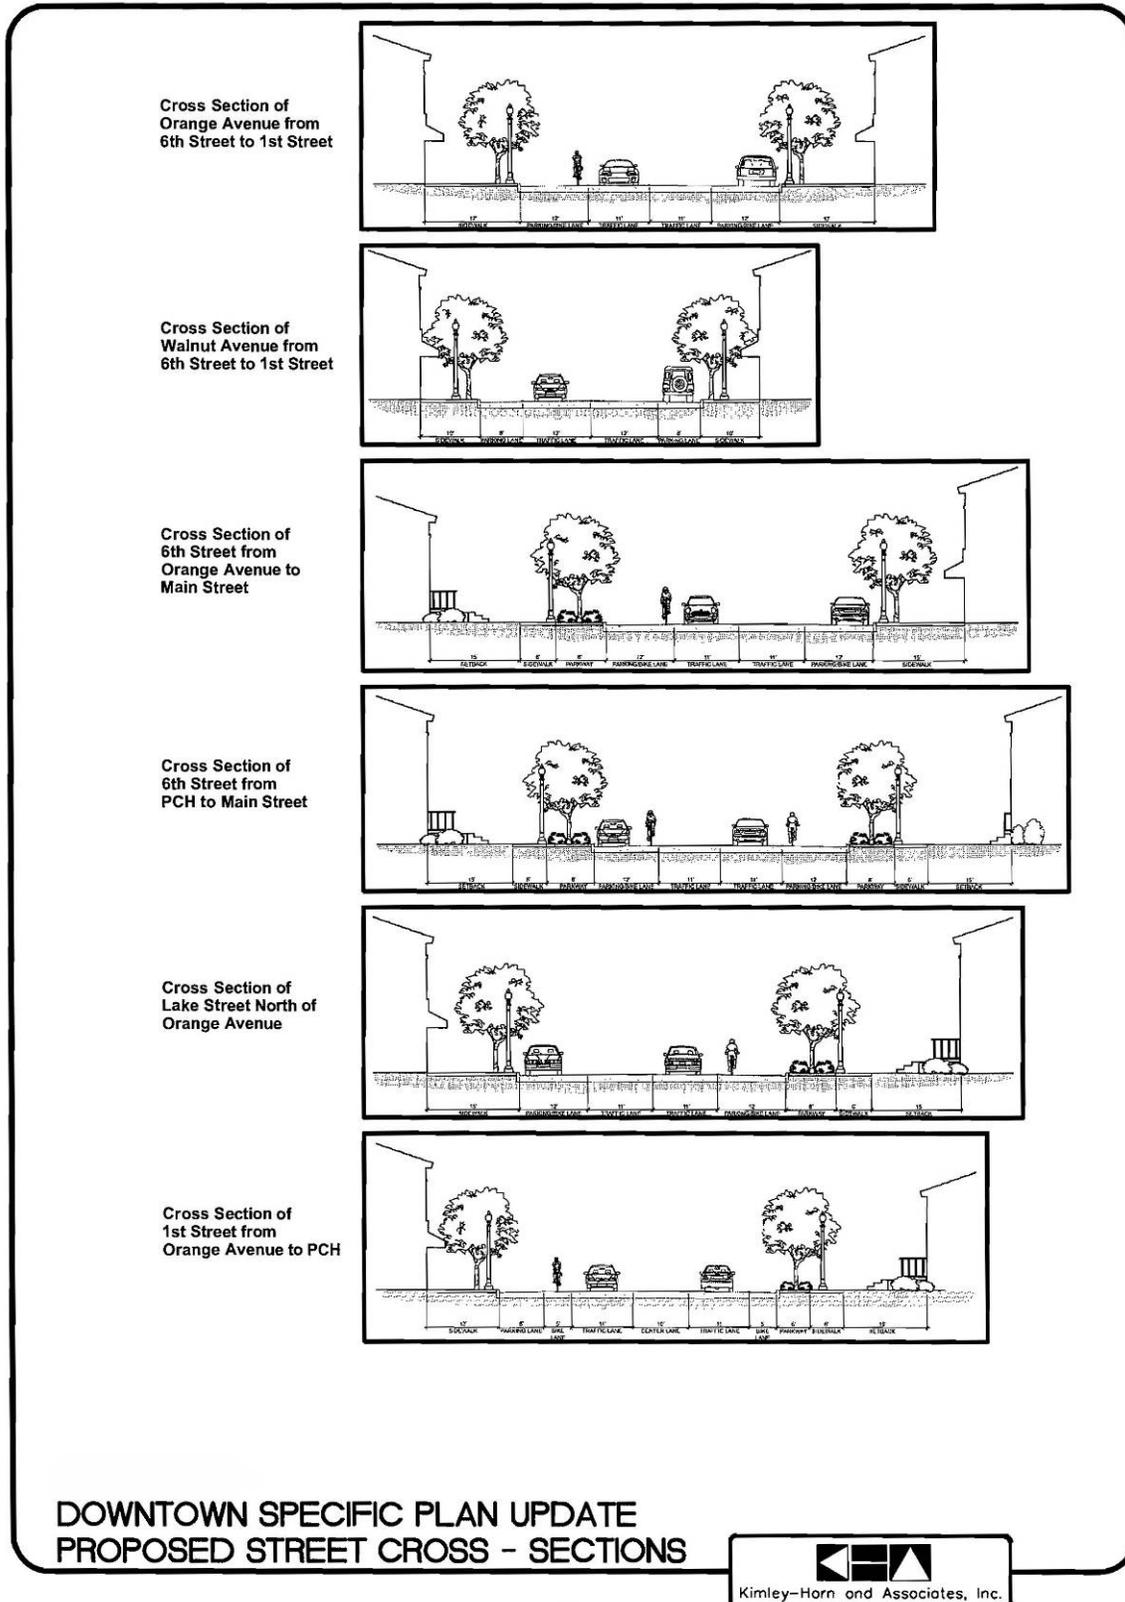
Proposed Street Cross-Sections (2)
